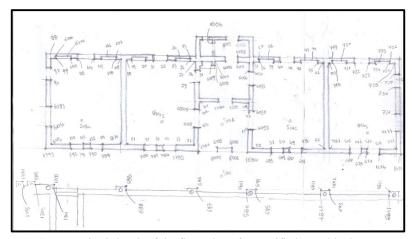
Improvised sketch of the floor plan of a specific house block.
